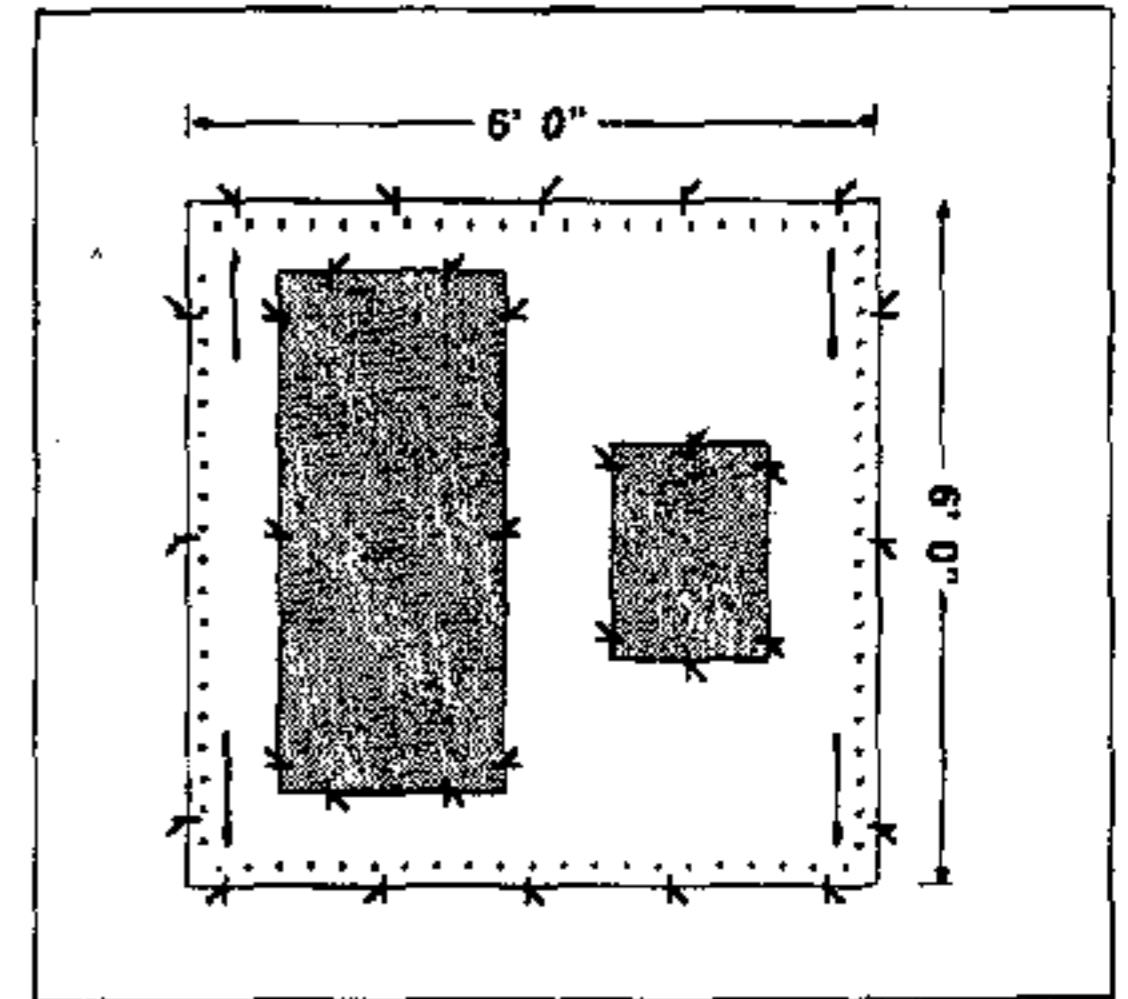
Roof hatch drawing for Type ACF air conditioning unit.
